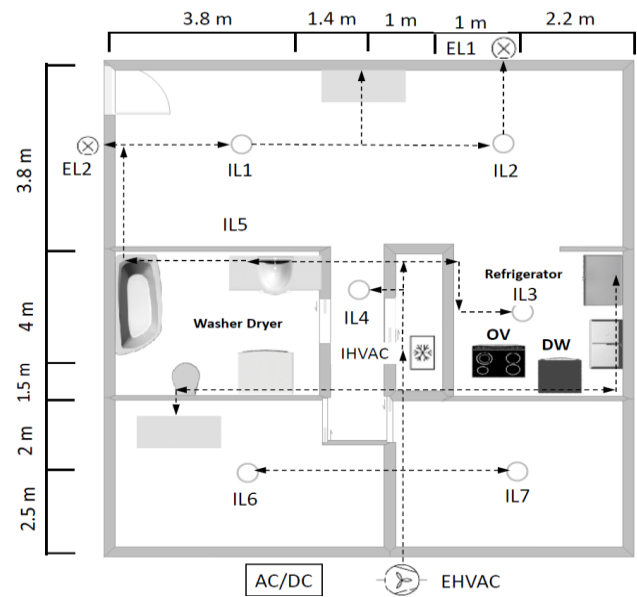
Electrical wiring diagram of one living room and two-bedroom house
